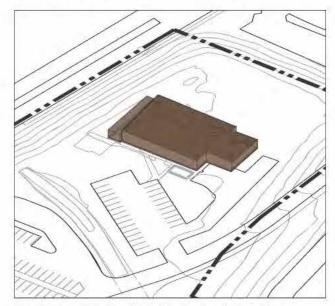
Axonometric and Site Plan of renovated CDC building
